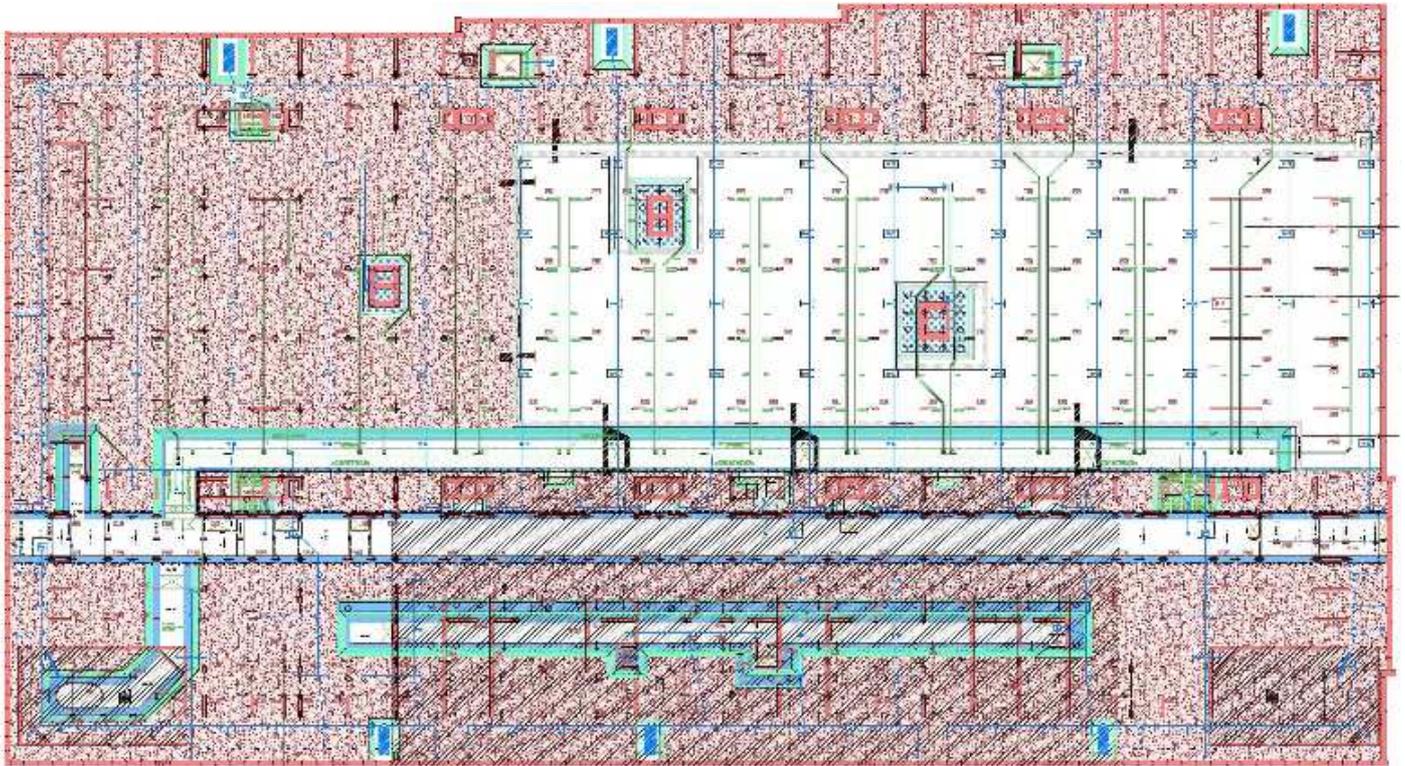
smoke extract ductwork systems within the foundation slab / Sistema di estrazione fumi all'interno della soletta di fondazione
